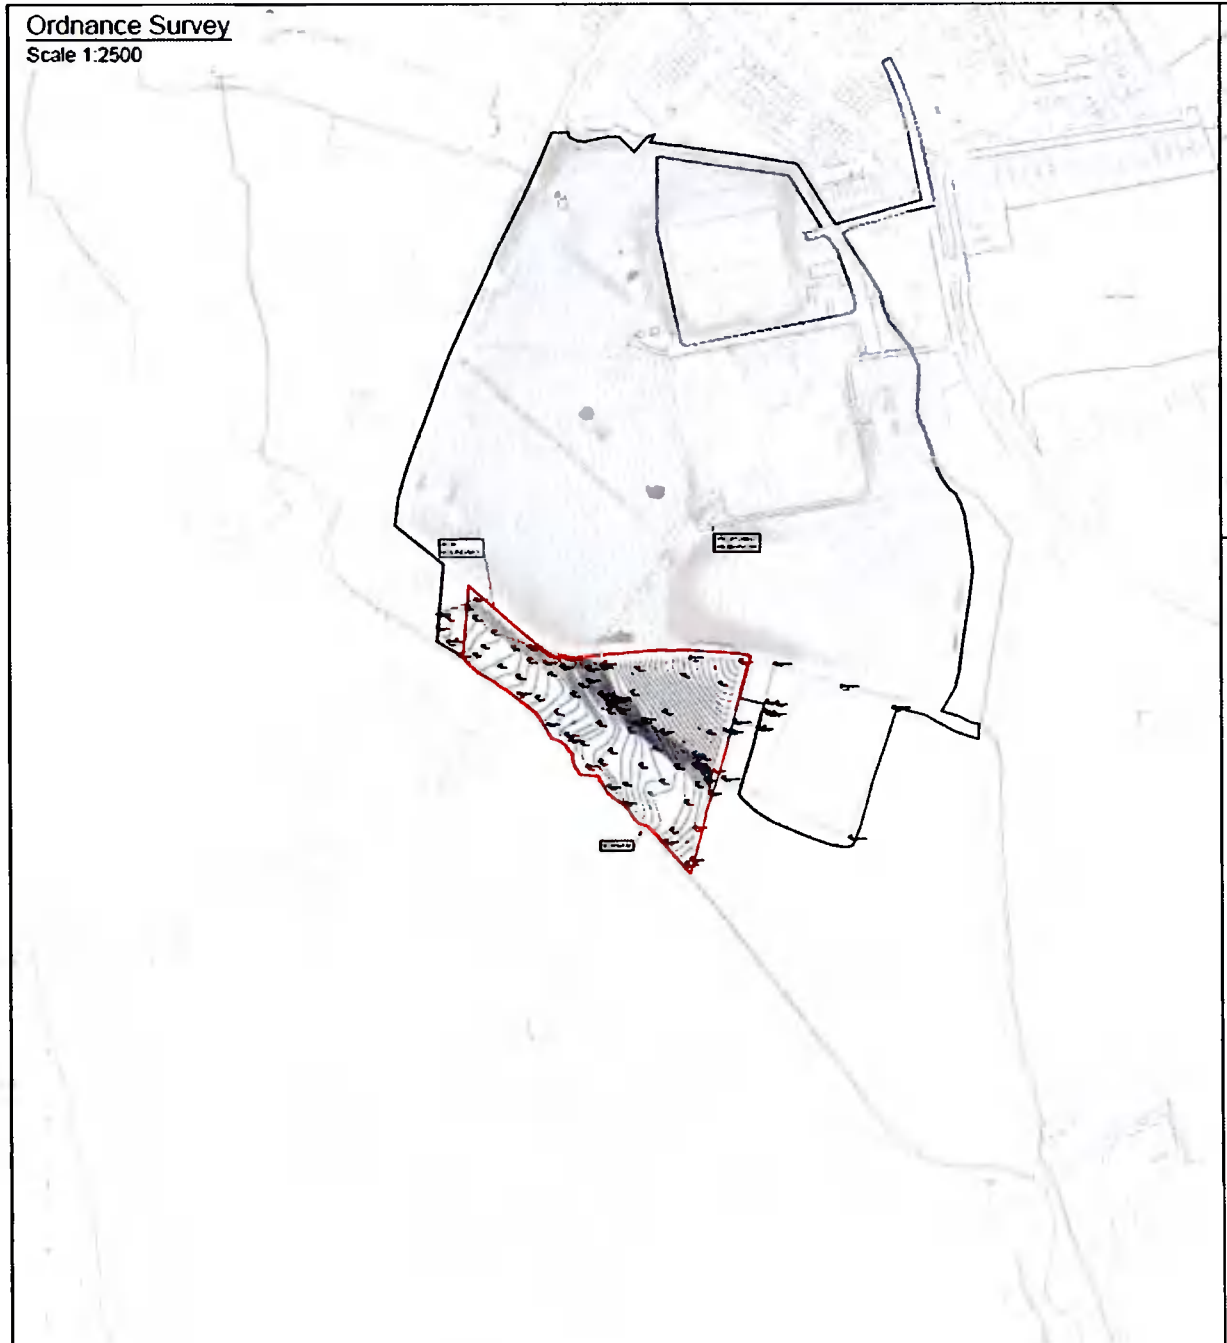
Site Location Plan and Site Plan with Proposed Development Boundary
